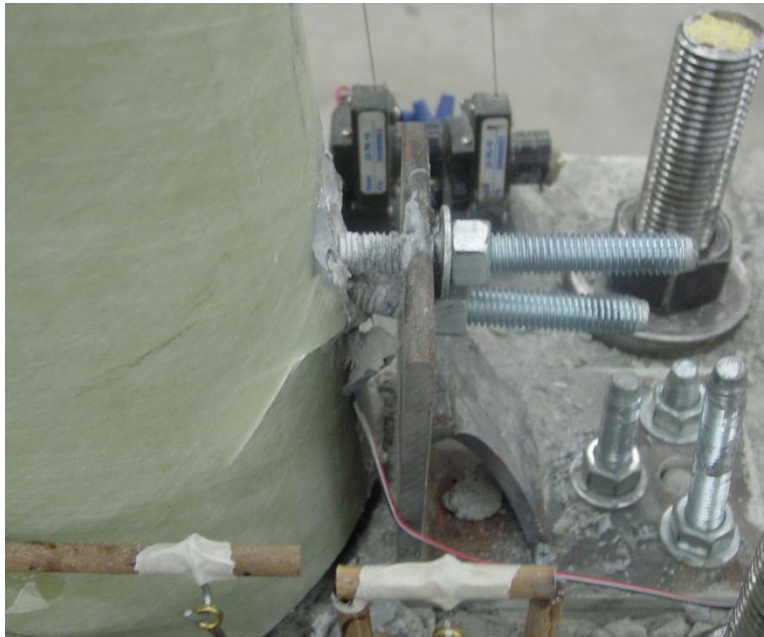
(b): Crack appeared at FRP tube as bolts fixing the steel angle to the lower column-segment of southern column of specimen F-FRP3-S were pulled out of position after 3.80 in. displacement level
